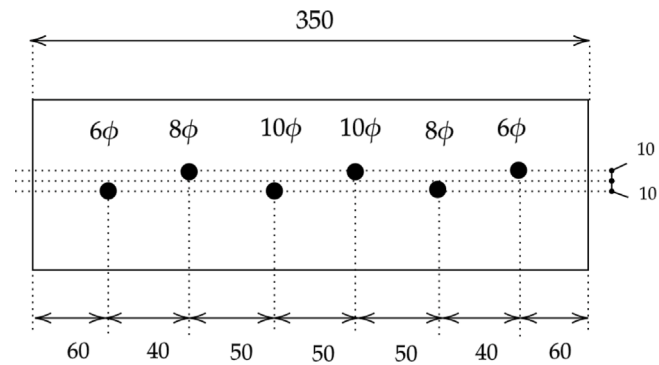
Screws arrangement KIT test (dimensions in mm).
